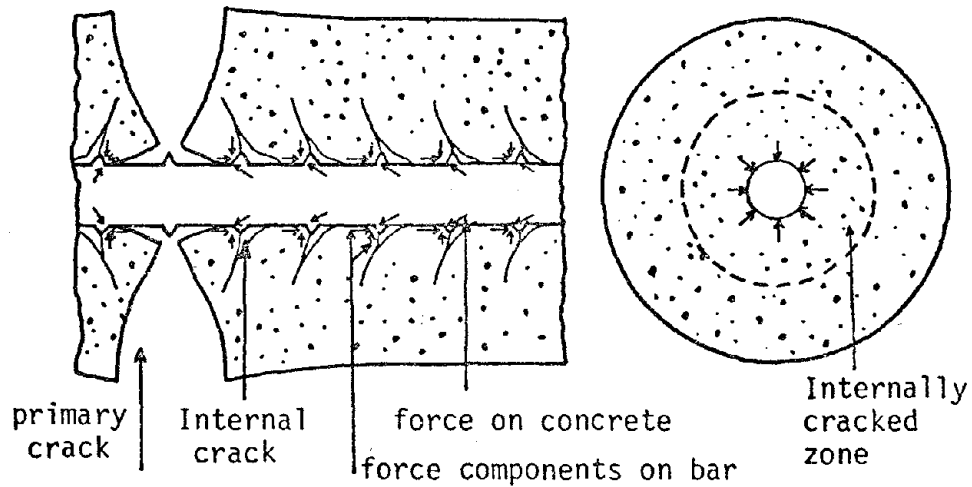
Deformation of concrete around steel reinforcing bar after formation of internal cracks (schematic diagram). (Goto 1971).
